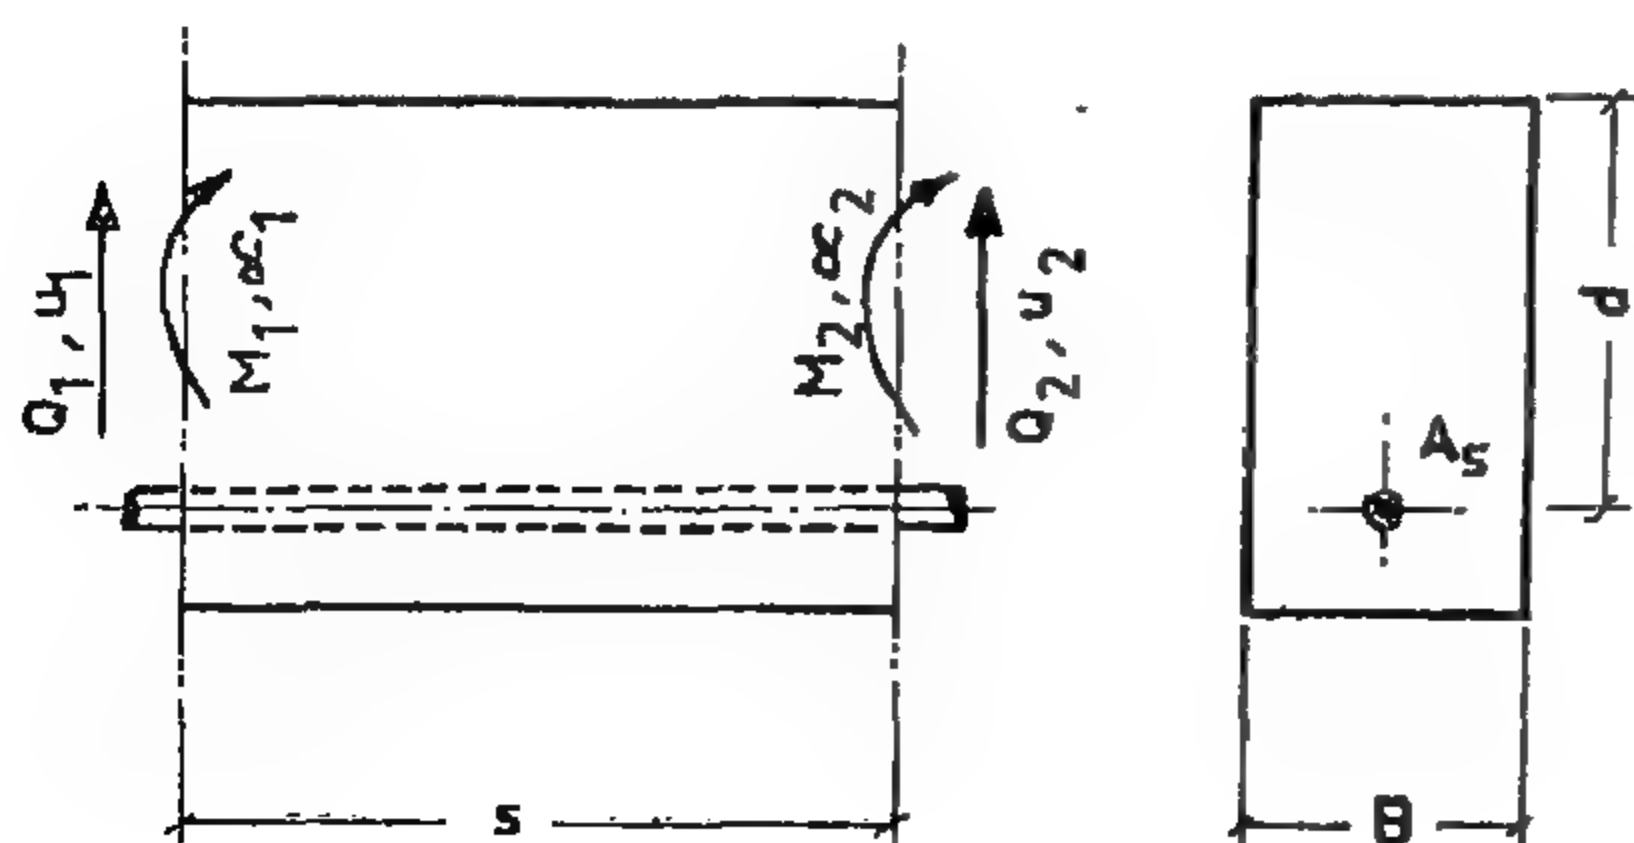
TYPICAL REINFORCED CONCRETE ELEMENT.
